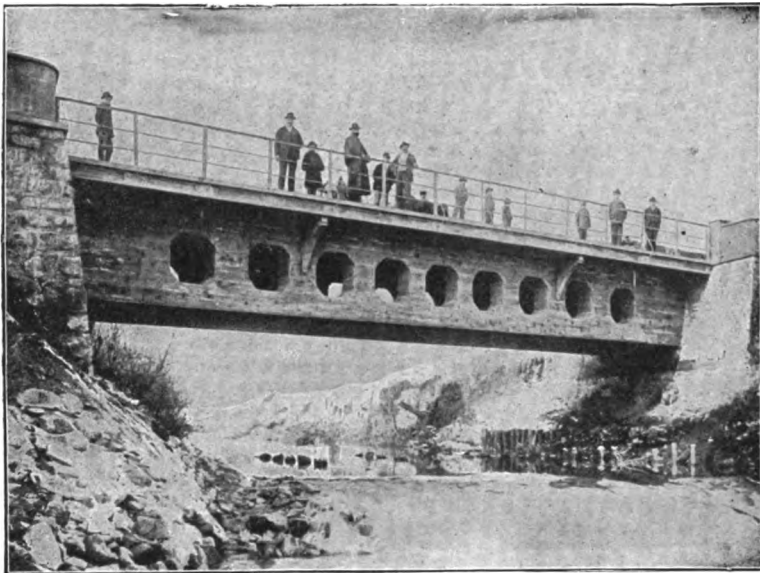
Bridge near Krapina, with open girders of 200 m. (66 ft.) span.
